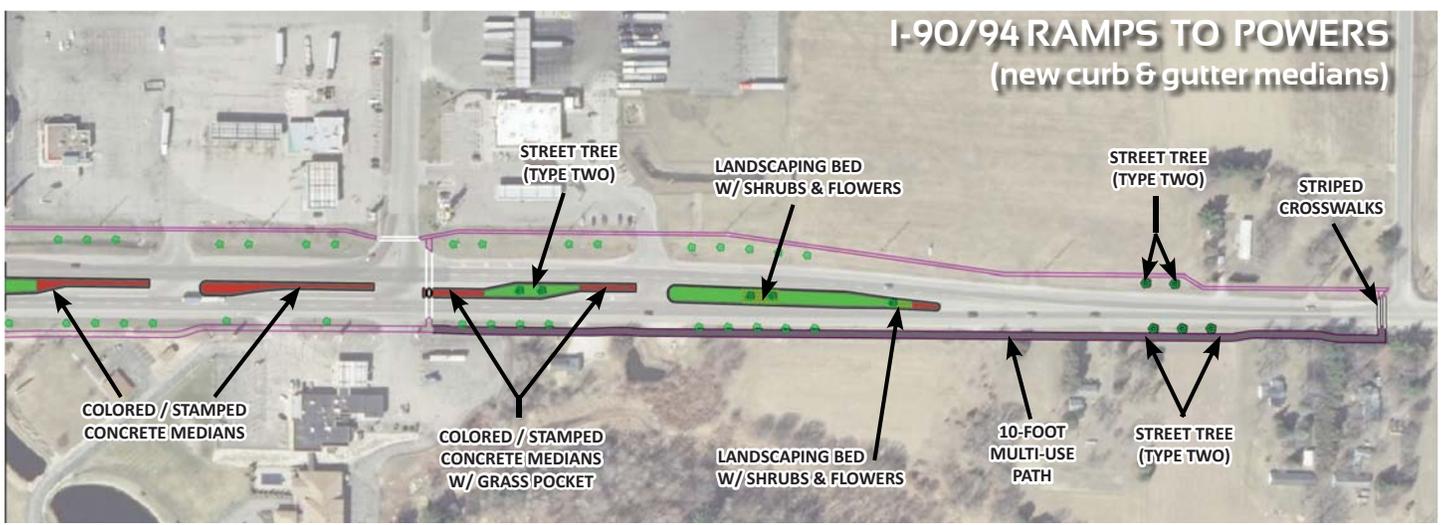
STH 82 Streetscaping Plan - Long Term (Median Reconstruction, Landscaping, and Streetscaping)
